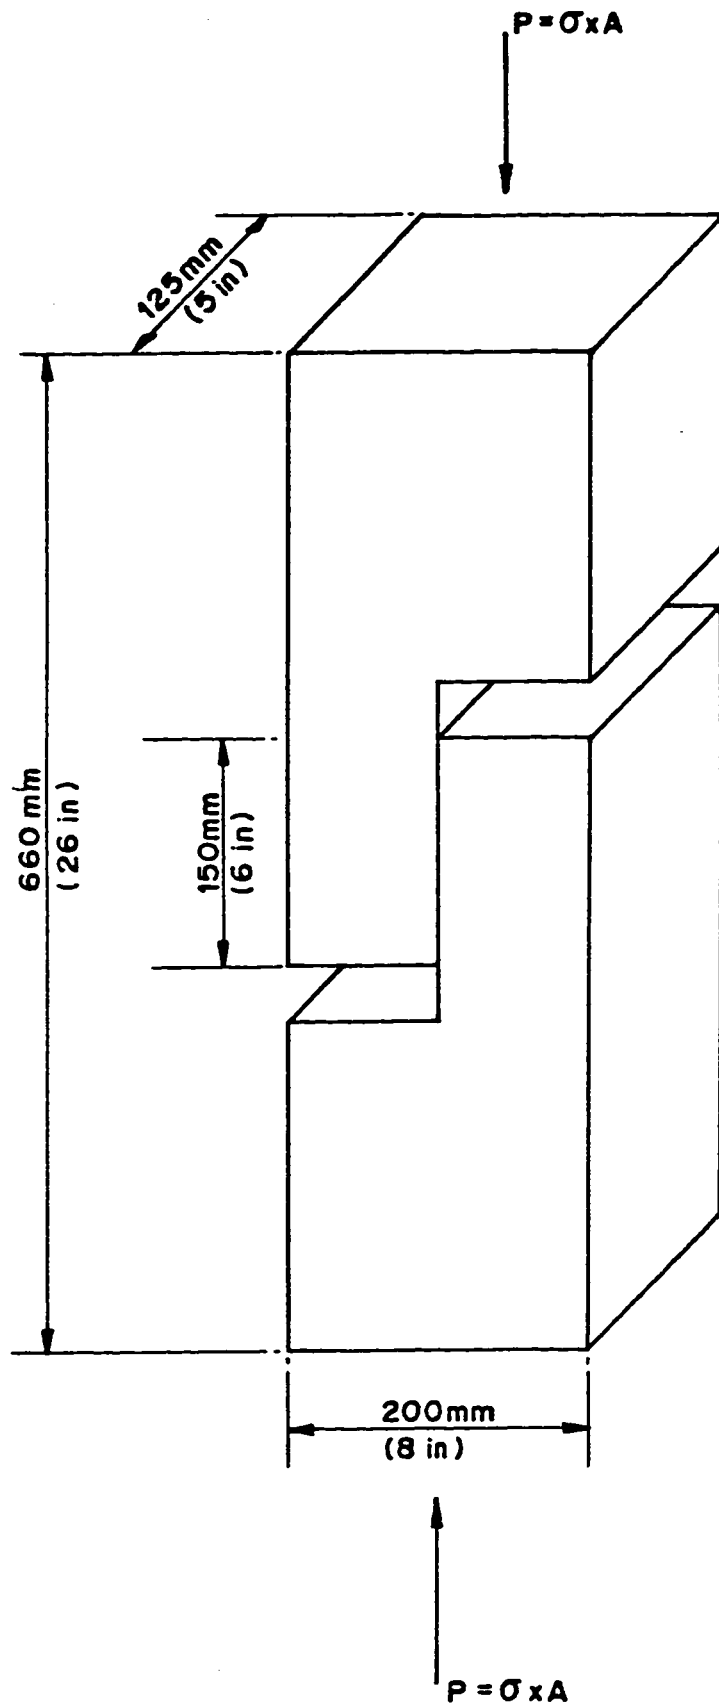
The Push-off Specimen for Testing the Epoxy-Concrete Bond in Pure Shear.
